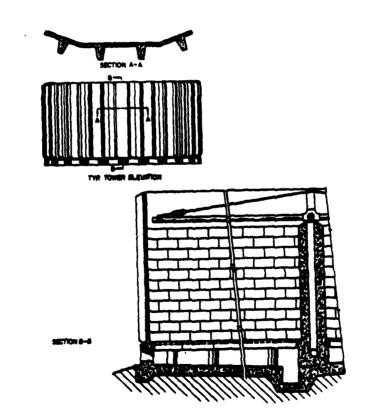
Precast double-tee containment structure and section. (From Drawing 8, Information Bulletin [B. F. Goodrich].)
